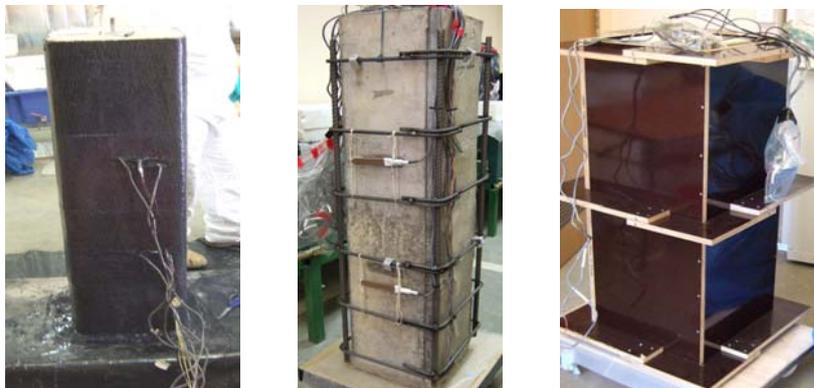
Views of model piles after repair with CFRP (left); fitted with reinforcement (centre) and after fitting mould for casting concrete jacket (right).
